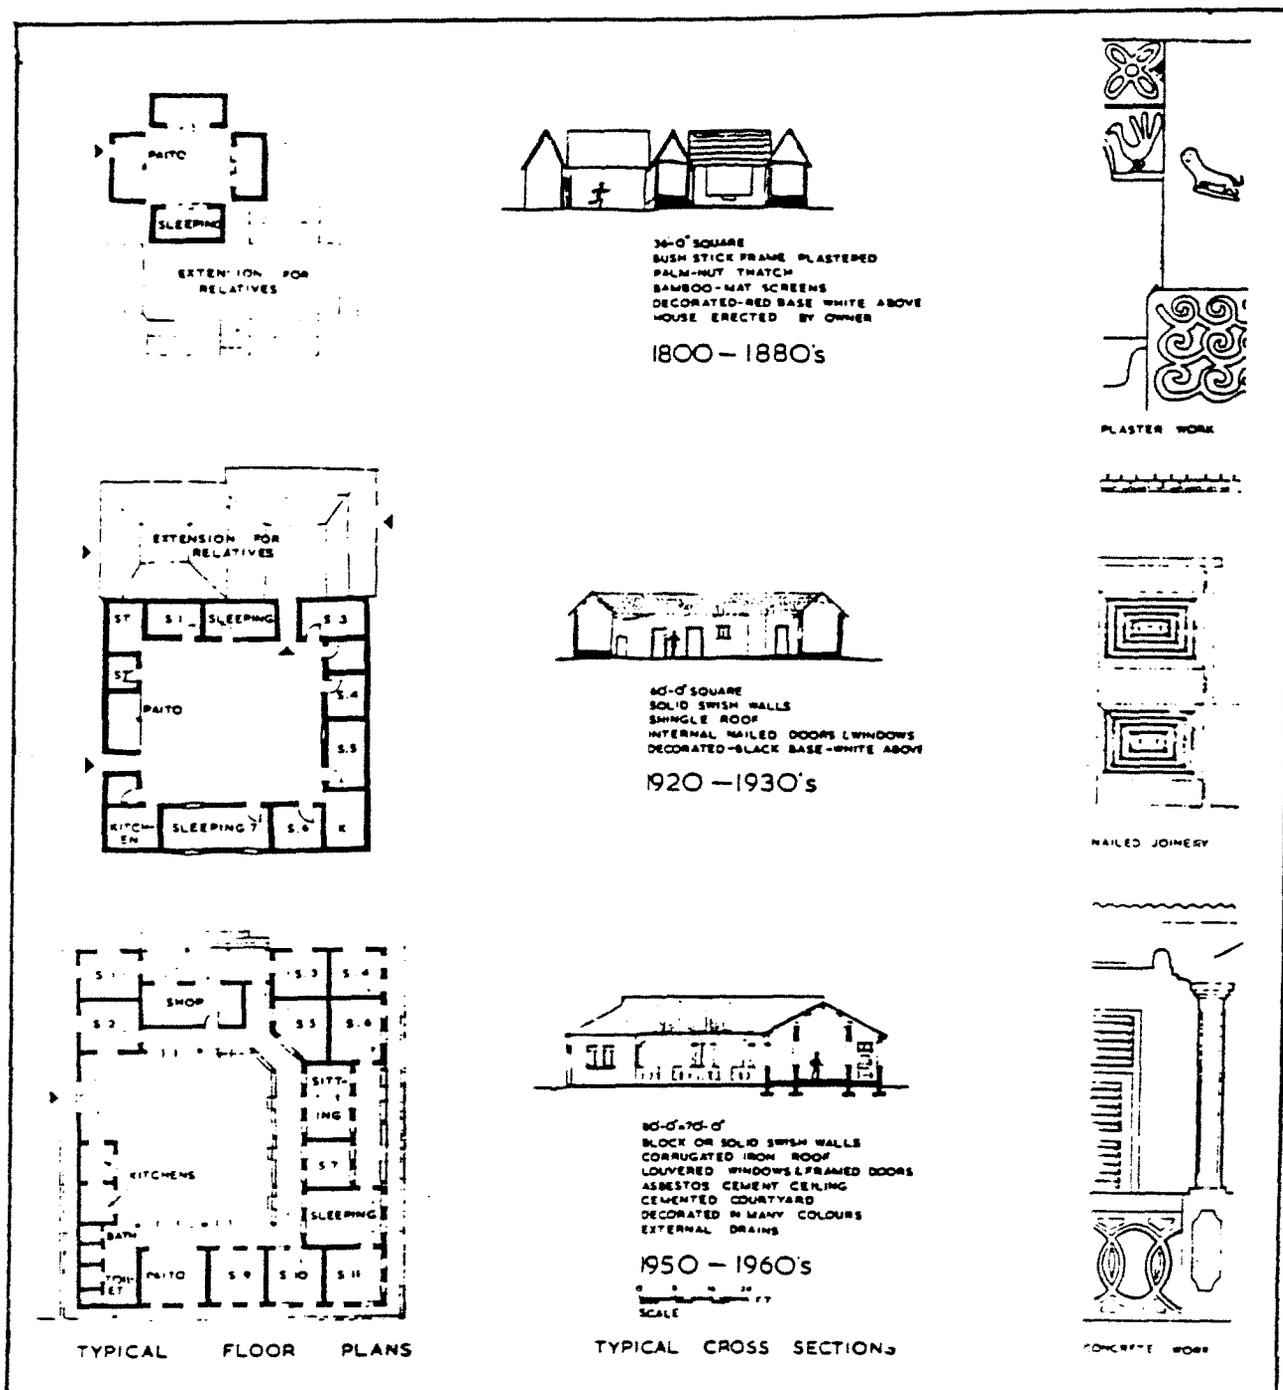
(a) Sketch plans of typical Ashanti single-storey compound house
